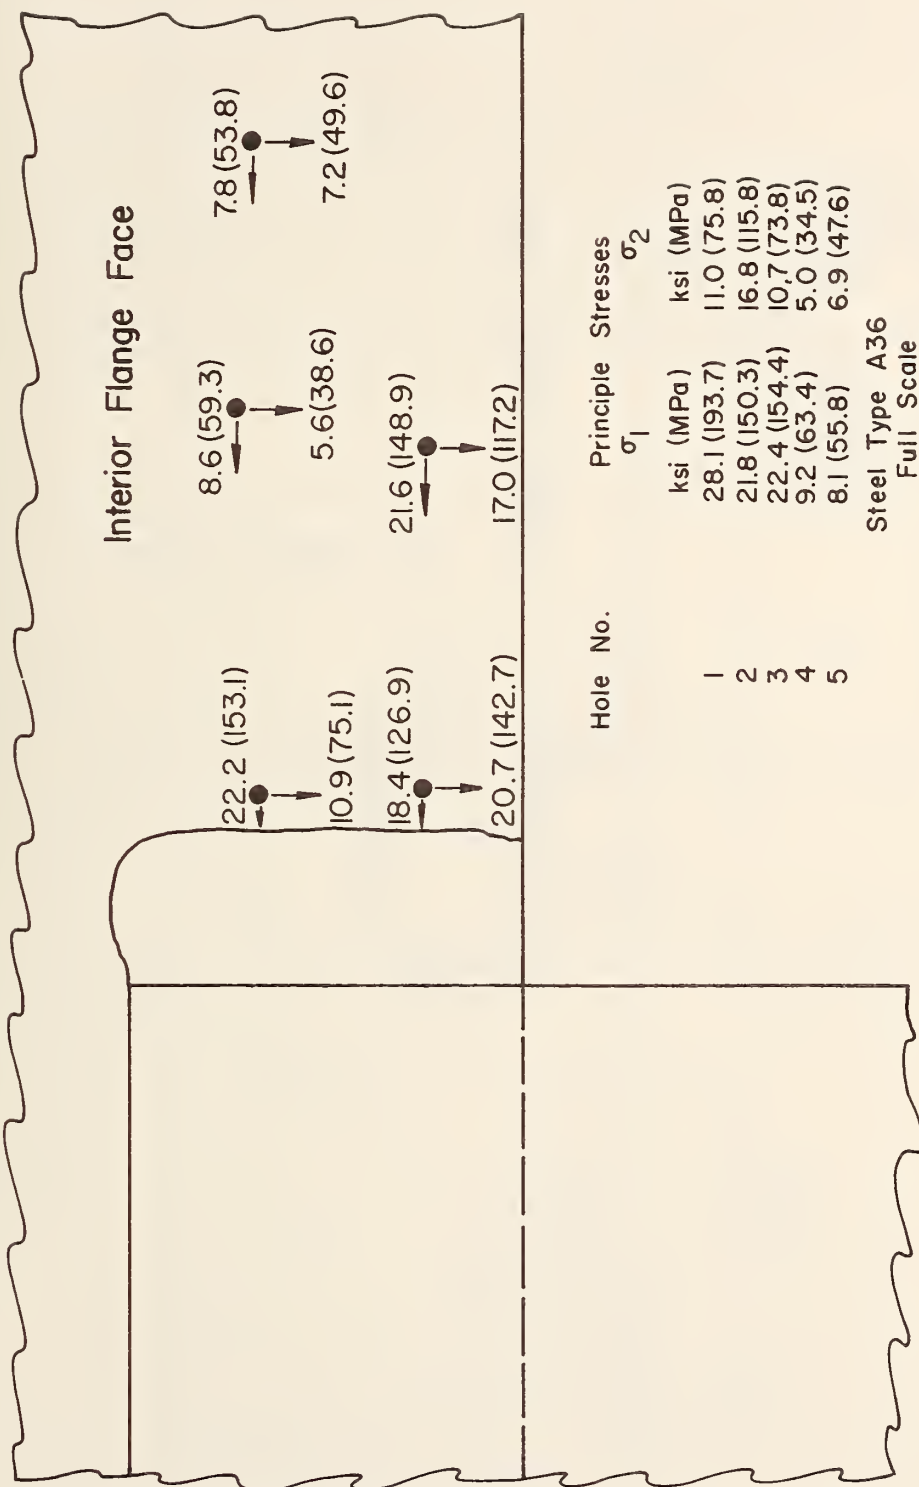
Lap Weld Lateral Attachment Surface Residual Stresses
